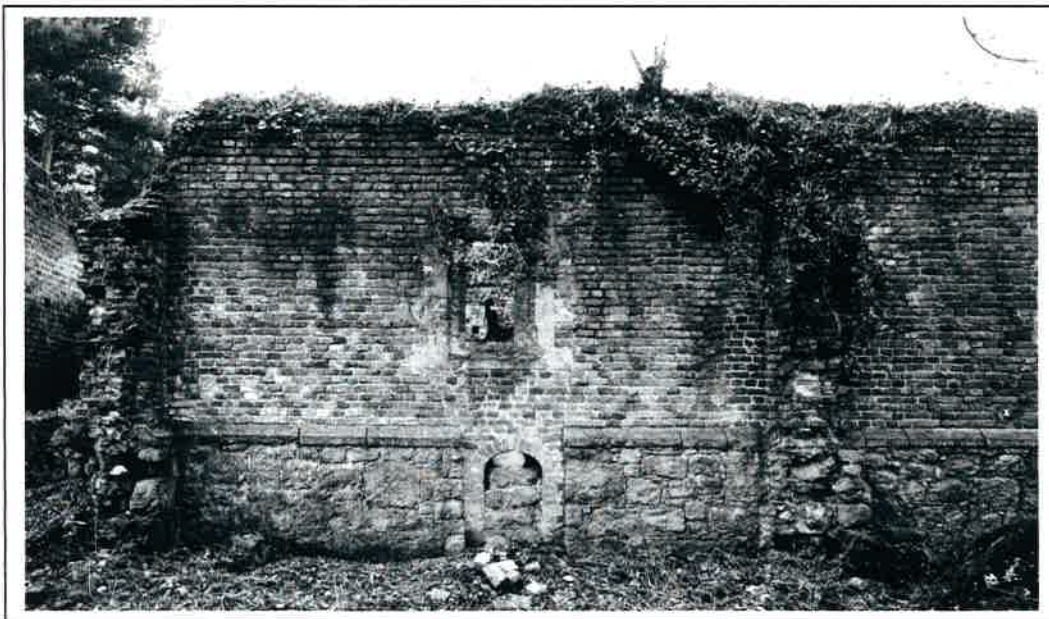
East elevation of larger dovecote showing buttresses and secondary openings
